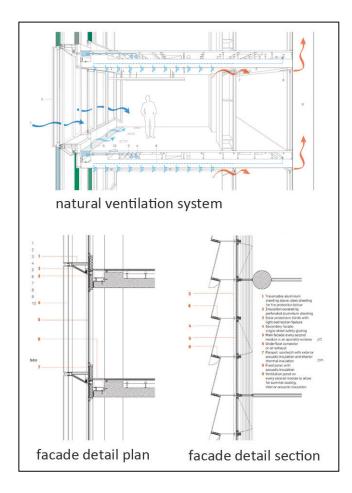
KFW Westerkade building- natural ventilation system and facade detail (courtesy of Sauerbruch Hutton Architects)
